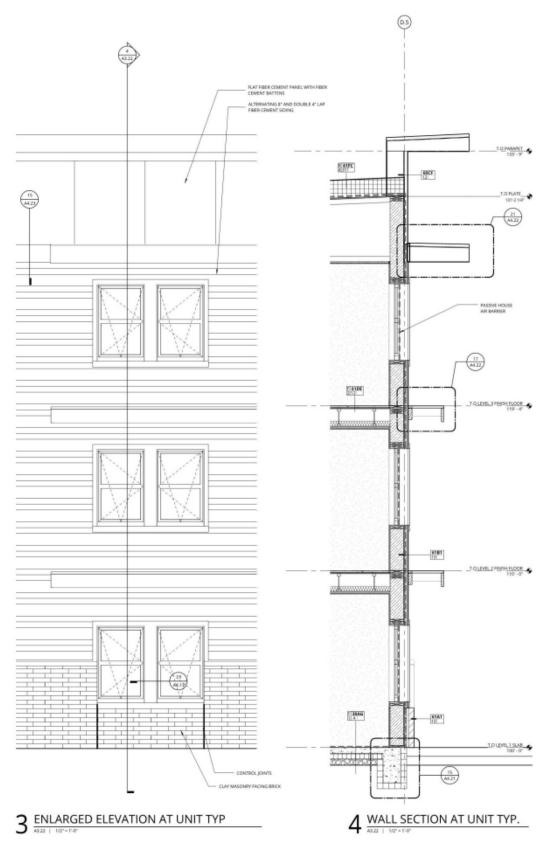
Architect's wall section drawing indicating configuration of air barrier system and thermal barrier
